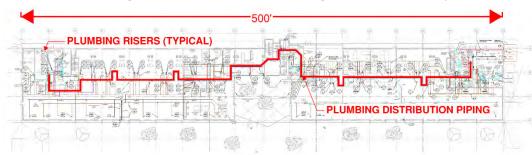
Plumbing Plan for One Floor of Building with Centralized System
